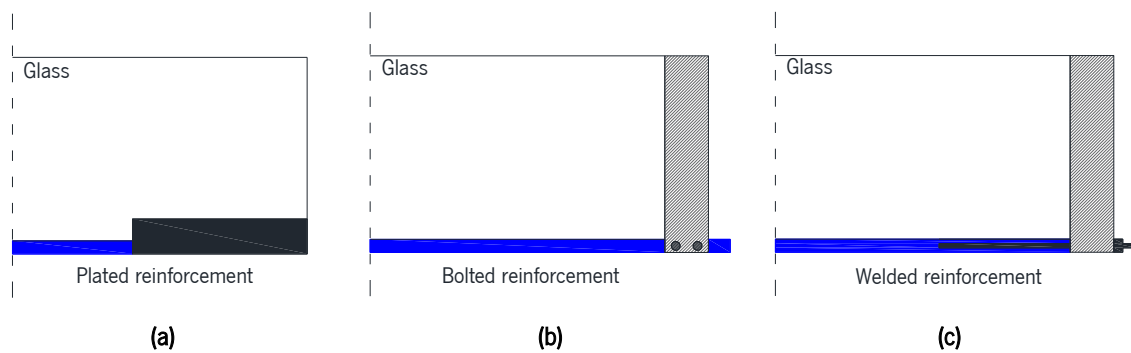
Anchorage of the reinforcement element at the beam ends studied by Louter and Veer [36]: (a) system #1; (b) system #2; and (c) system #3.
